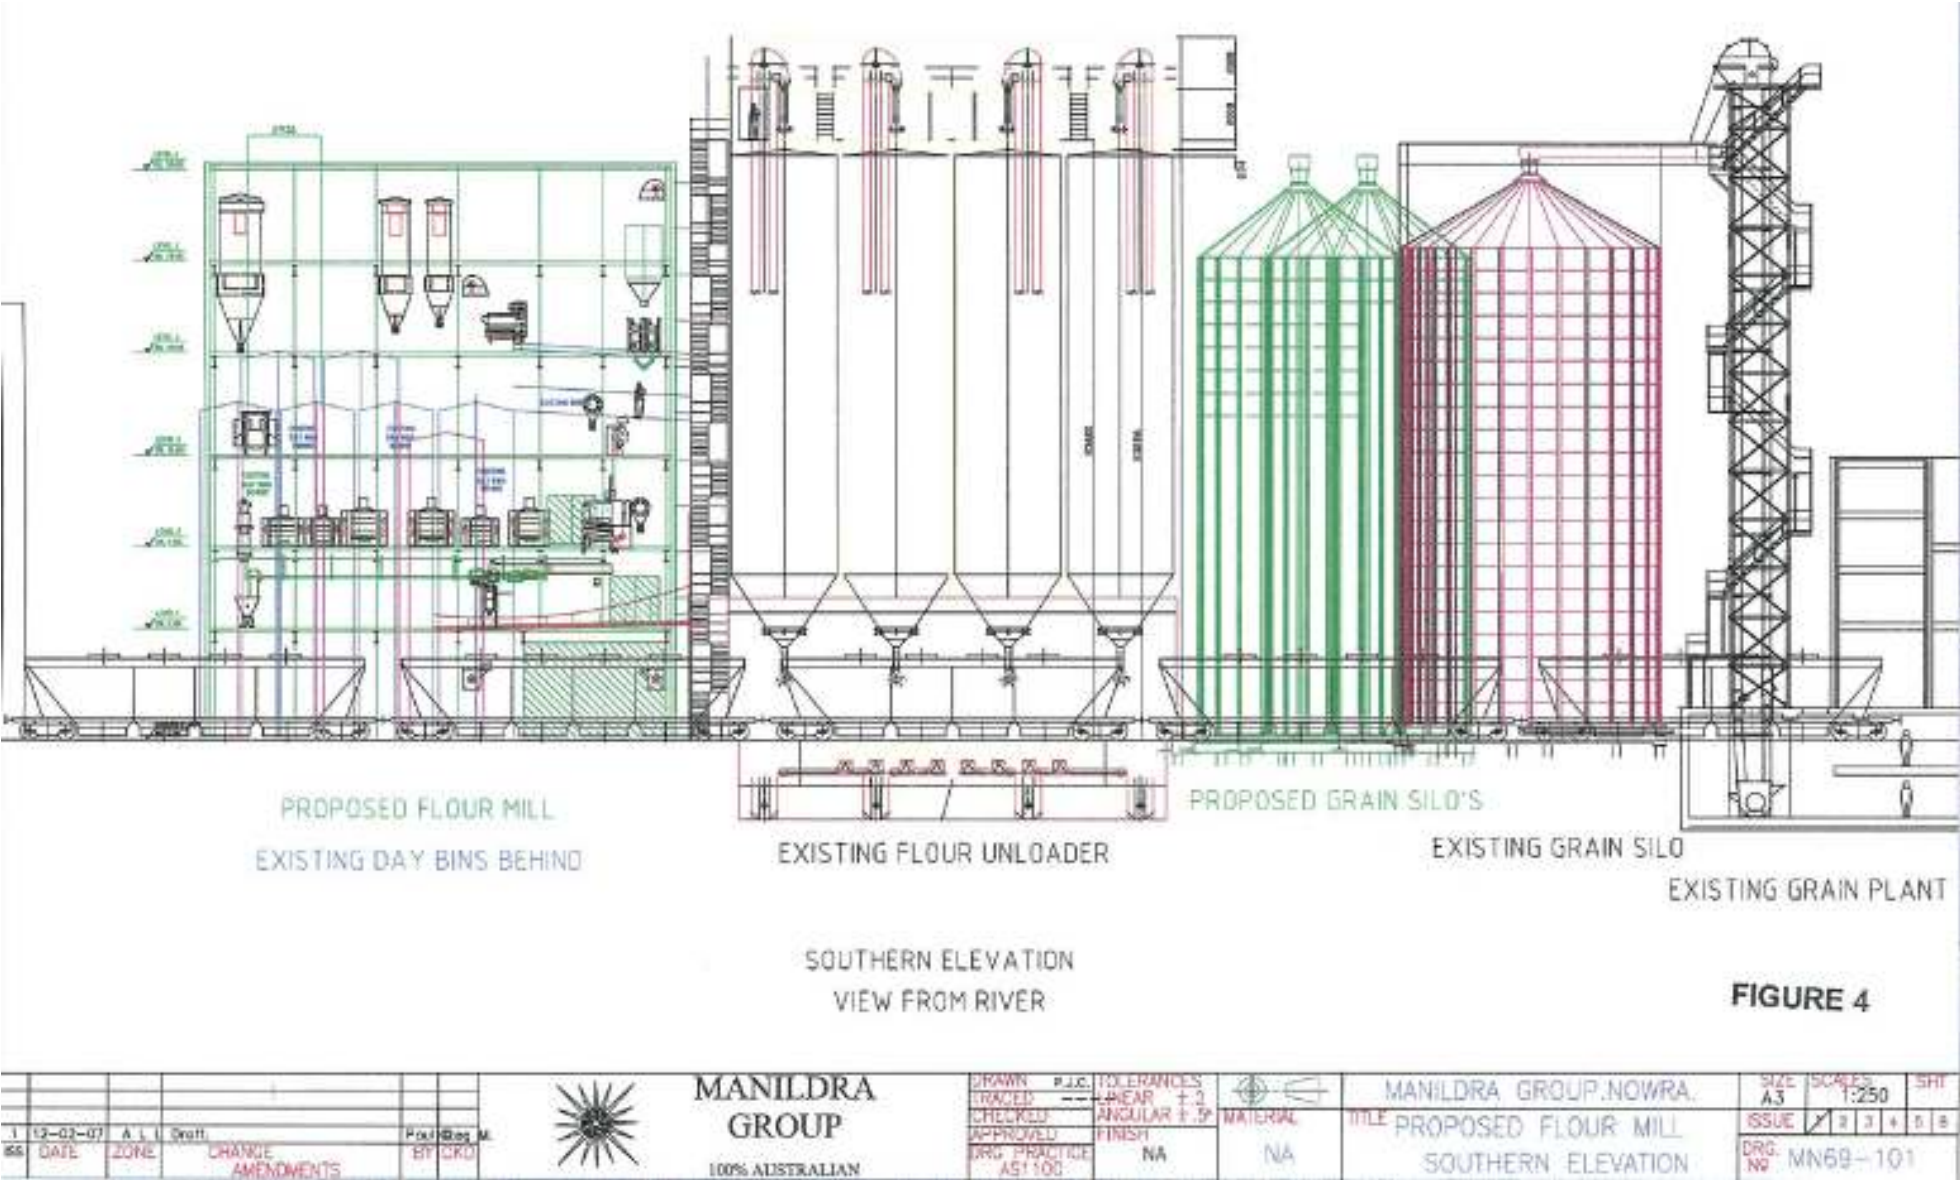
Proposed Flour Mill and Silos and Existing Infrastructure - Elevation
